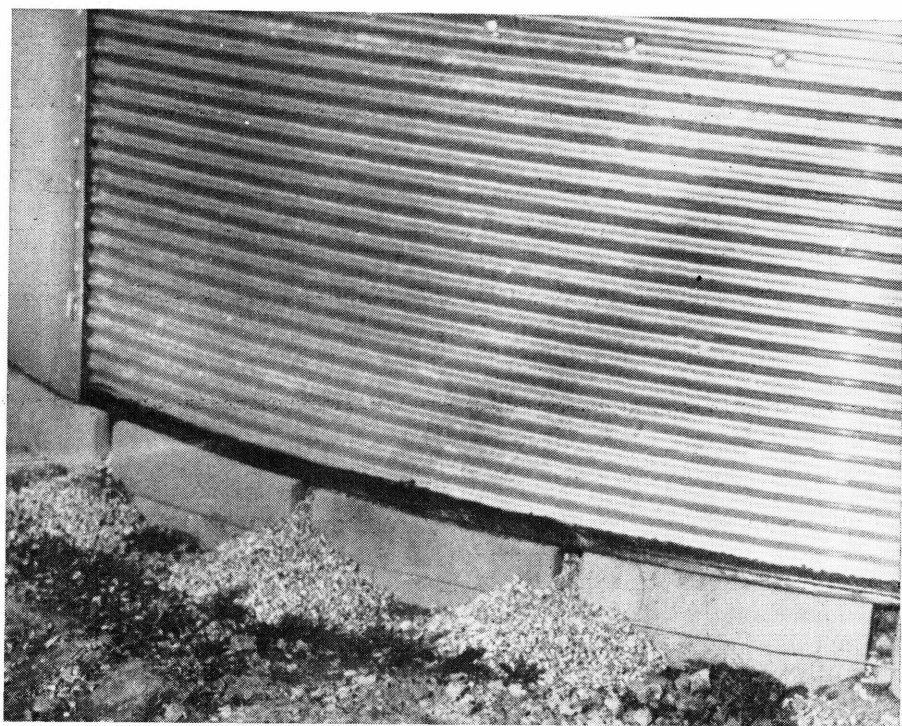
Grain leaking from a bin because the metal floor was not properly placed. The floor should extend to the wall of the bin, and the fill under the floor should be tamped solidly. The concrete blocks in the foundation should be placed tightly together to prevent the fill from running out from under the floor, and also to prevent rodents from undermining it.
